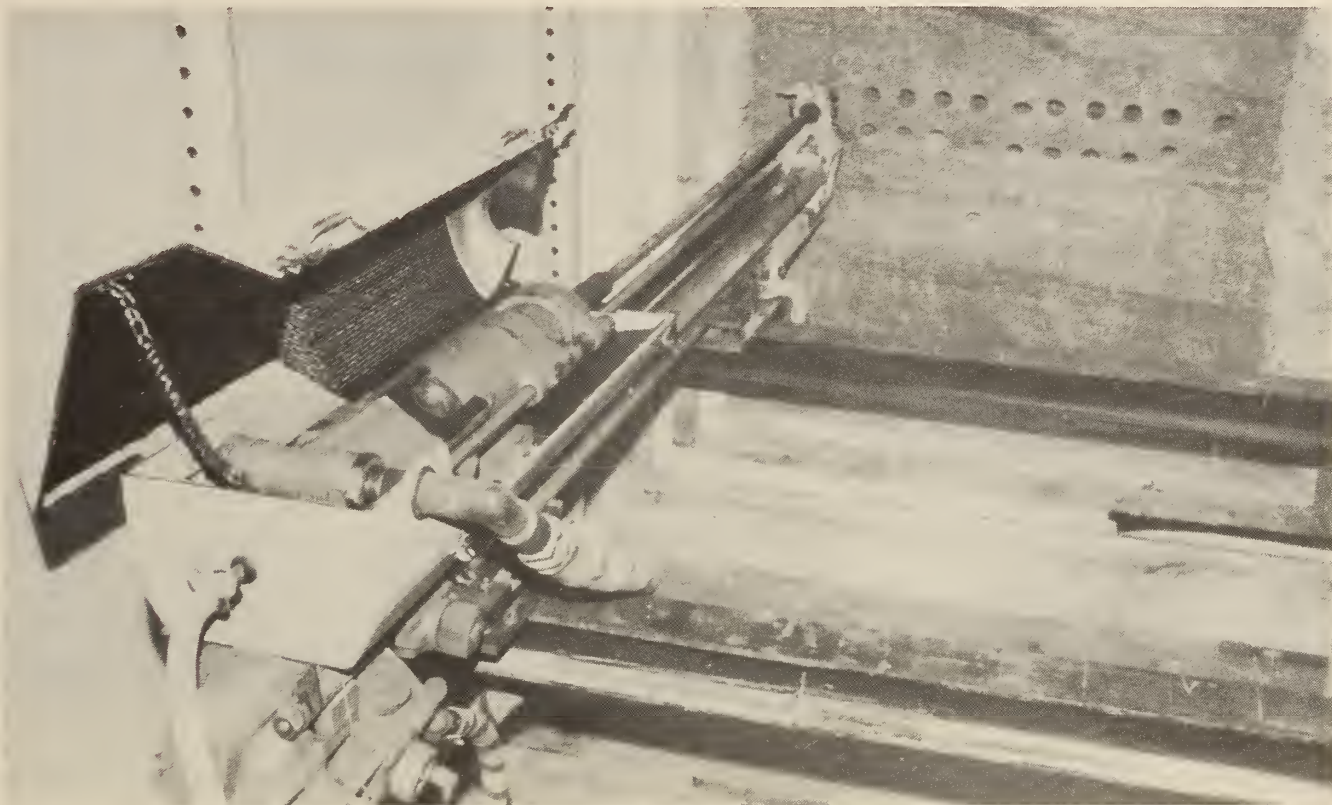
Jumbo drill within retrofit muffler enclosure (cover open).
